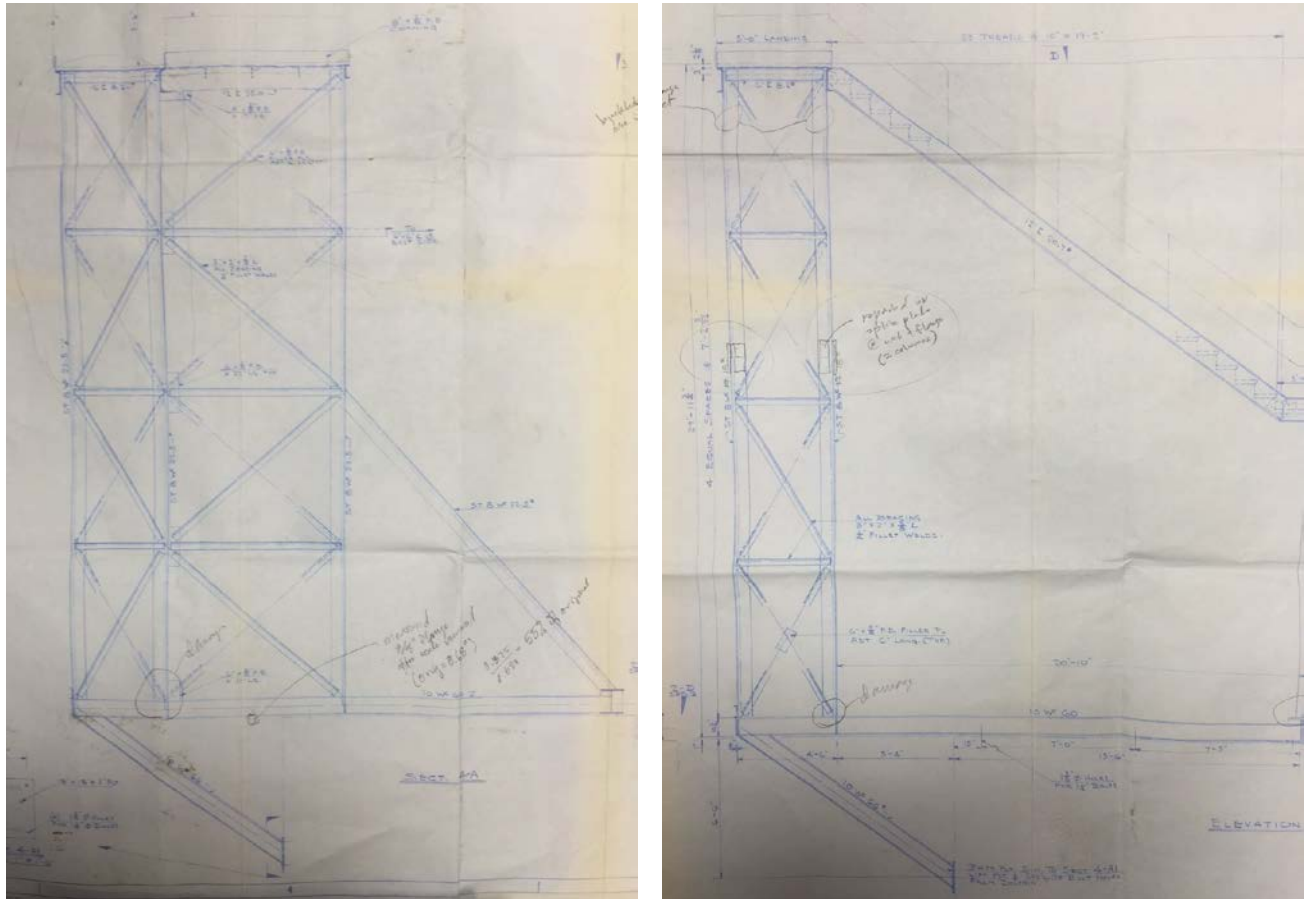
Original drawing cross section of stair tower at brow (left) and stair landing (right).
